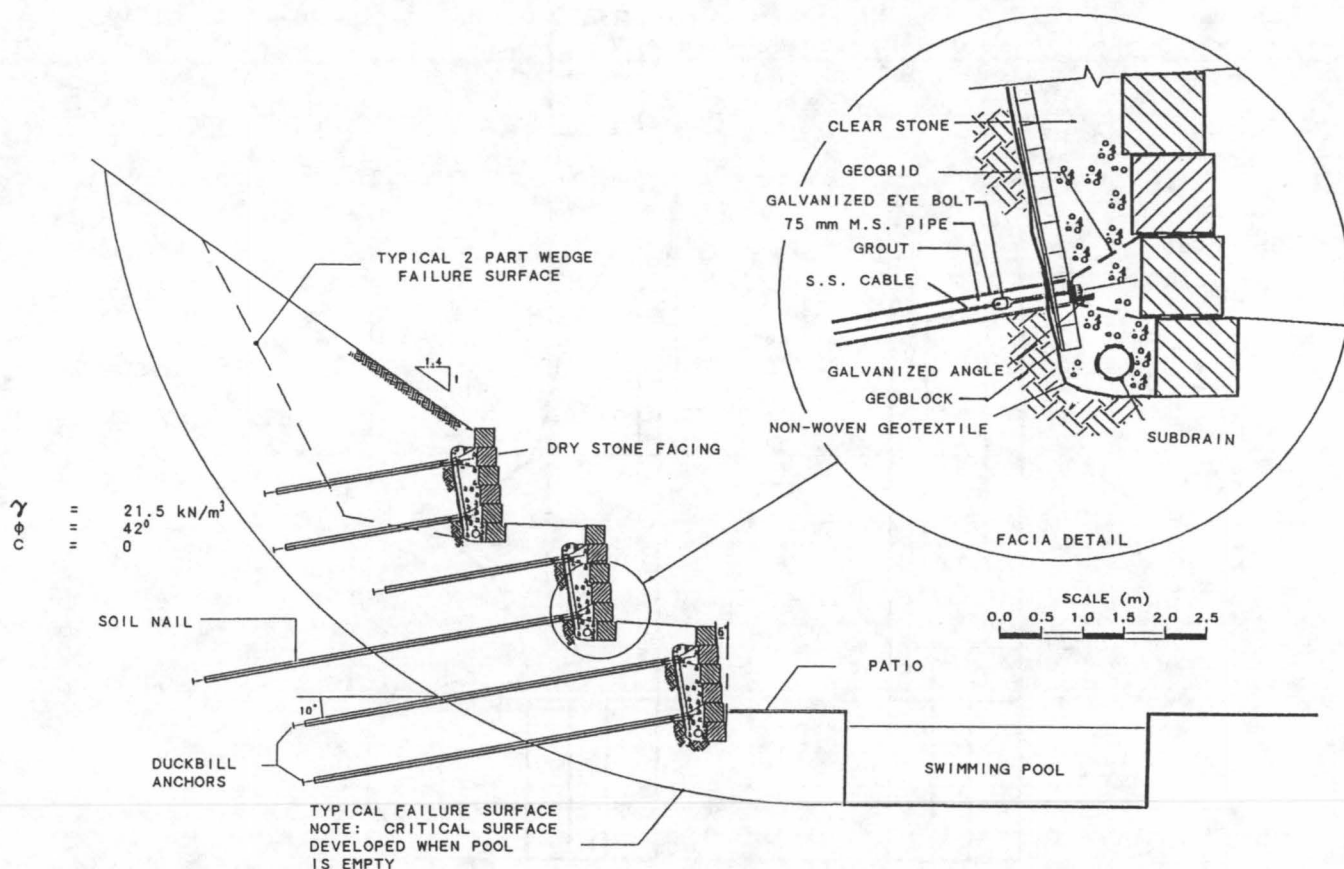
Section through terraced soil nail-reinforced retaining walls, Old Mill Drive site.
